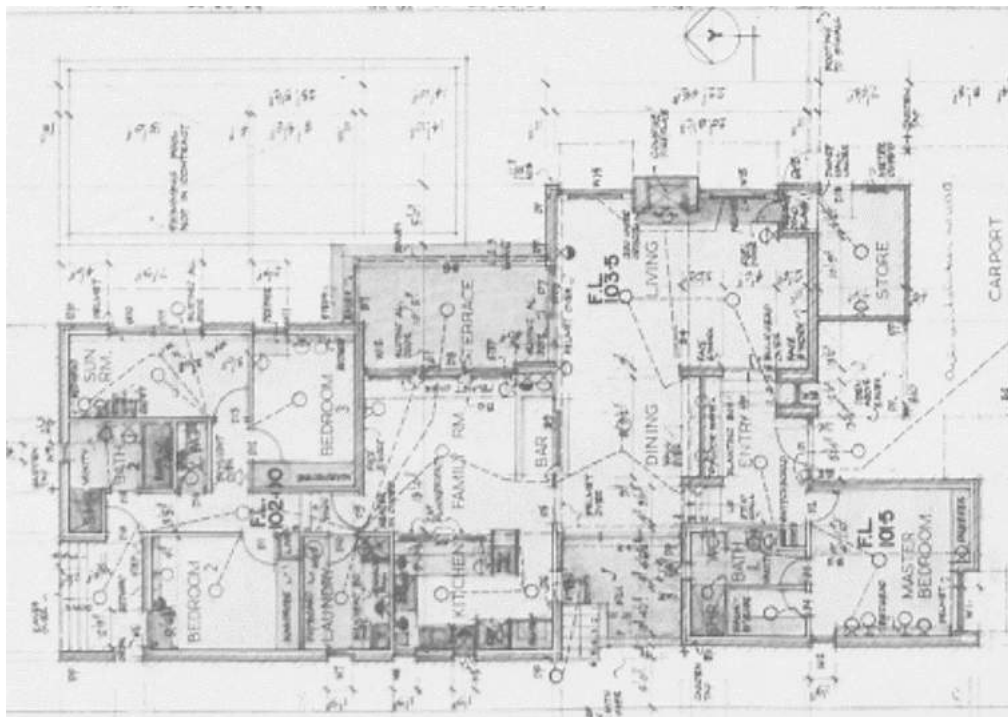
Site plan showing the layout of the house, 1969. North is to the top of the image (Source: Bayside Council Building Files)
